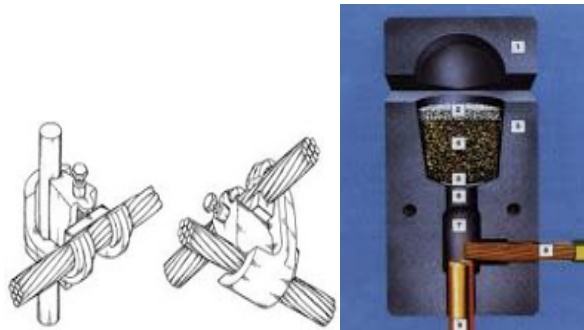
Two type of connection of conductors of grounding grids; (a) Bolt and nuts; (b) fusion welding
